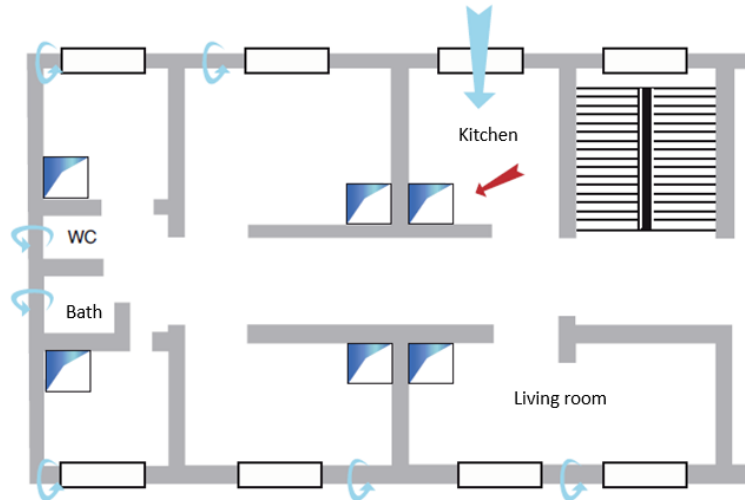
Separated rooms ventilation in buildings constructed between 1937 and 1958 [35]
